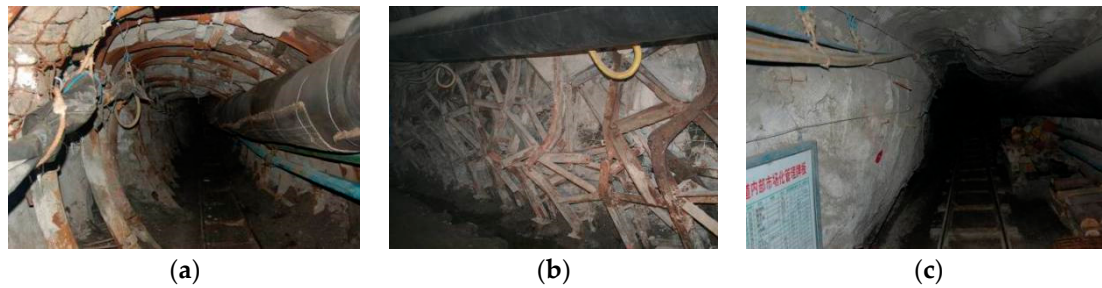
Argillaceous roadway site with different support. (a) U-shaped steel support in Zhuxianzhuang Mine; (b) truss in Liuhai Mine; (c) cable and grout in Liuhai Mine. U-shaped steel support and truss cannot effectively restrain the deformation of surrounding rock mass.
